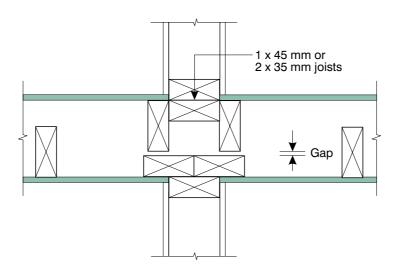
BEARER SUPPORTED OFF STAGGERED STUD WALL
